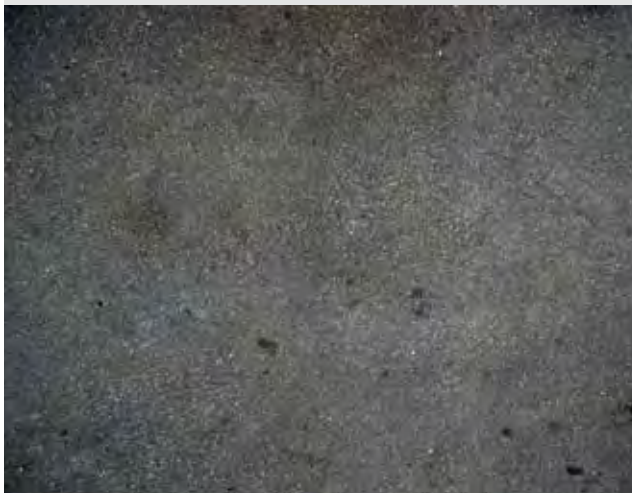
Westminster Bridge is paved with asphalt and wide kerbs
